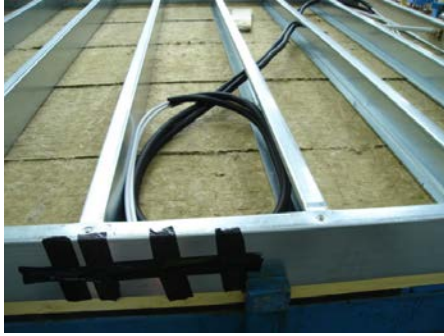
(left): Floor panel with rigid insulation fitted to underside, and space heating pipework fitted
